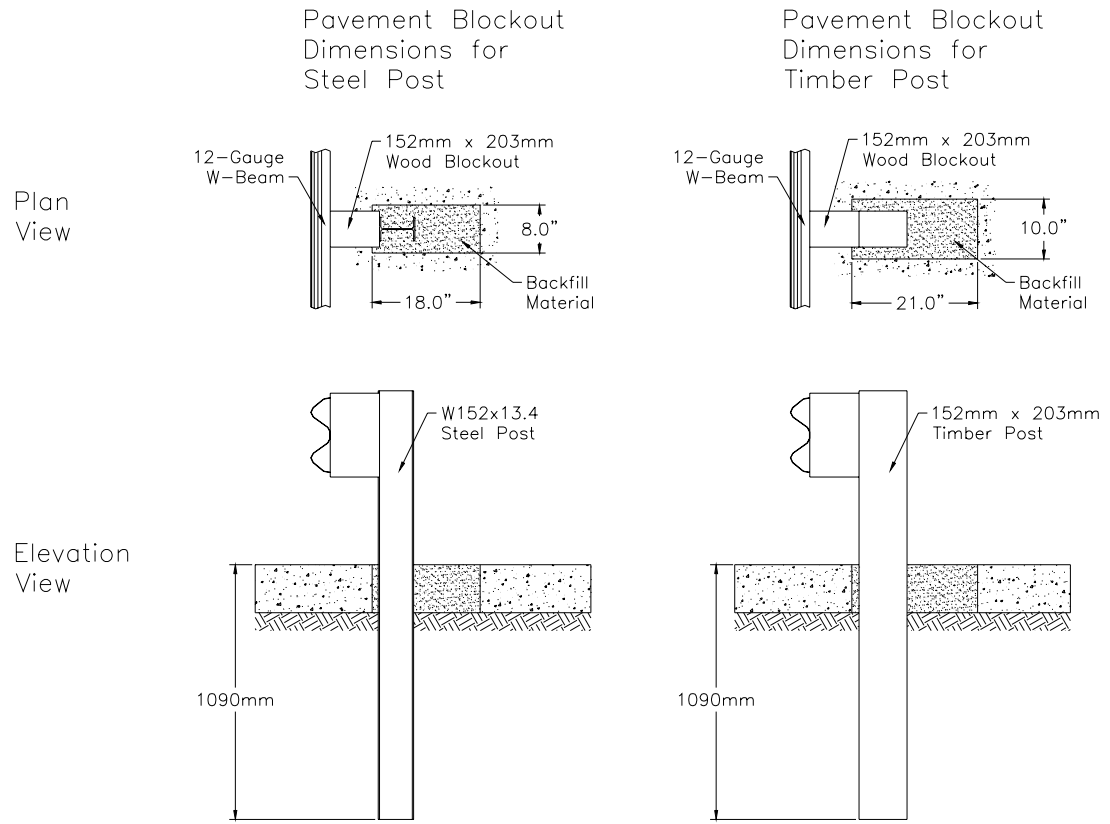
Details for Blocking Out Concrete for Guardrail Posts
